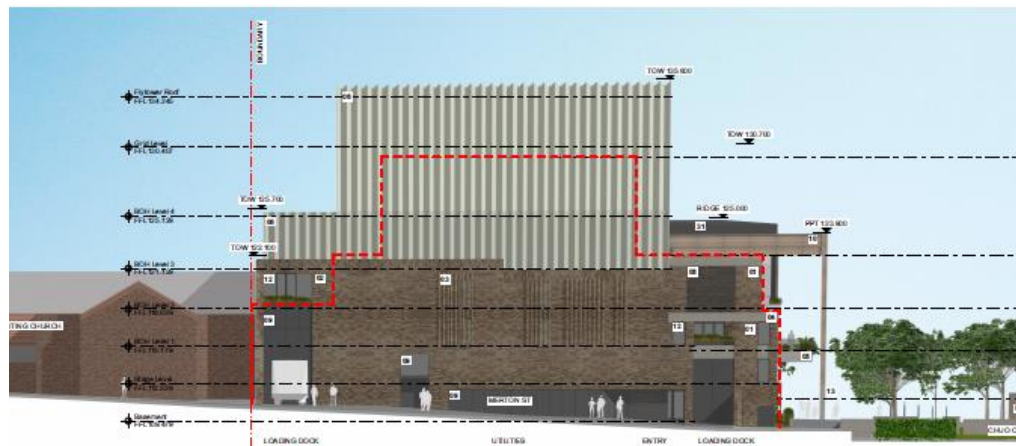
Proposed Merton Street Elevation showing outline of existing building dotted red. (Source: NBRSArchitecture and CHROFI)
